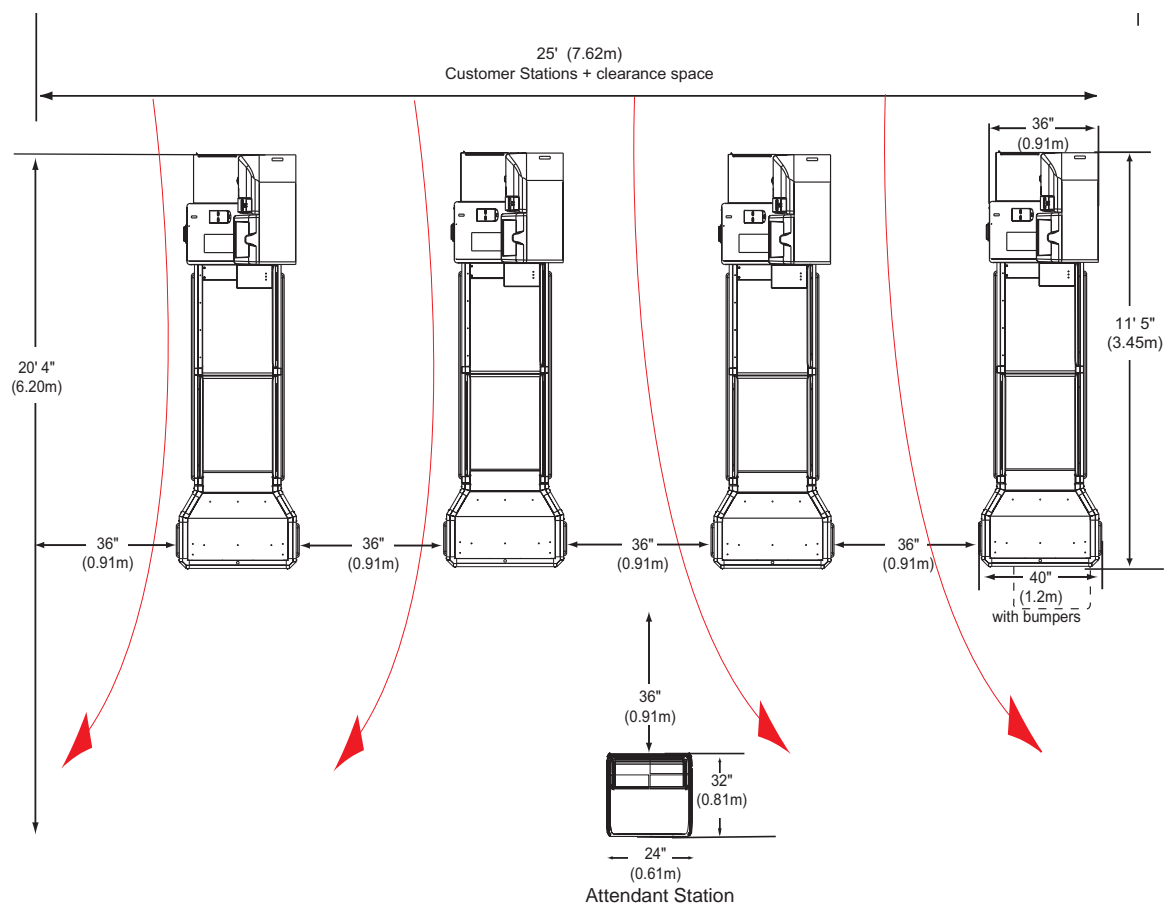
Four U-Scan Max Single Belt Customer Stations with 24" Attendant Station floor plan
